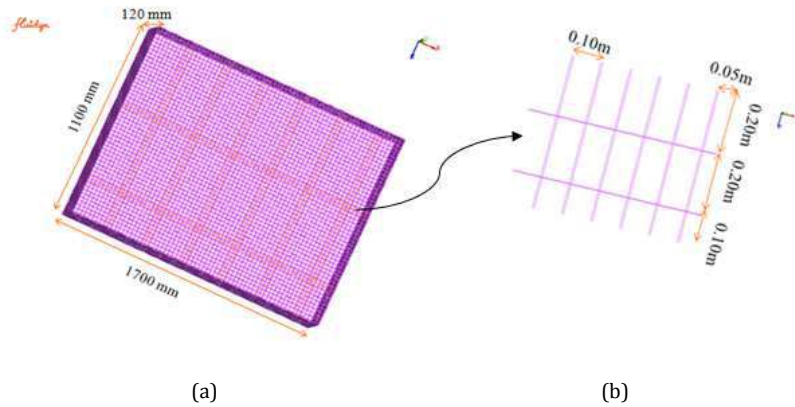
the finite element mesh (a) concrete with reinforcement (b) reinforcement detailing
